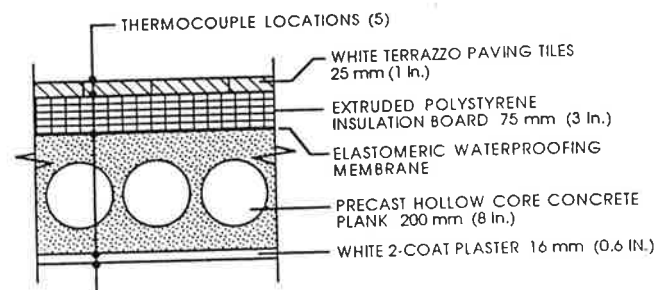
Roof 10: externally insulated (extruded polystyrene) concrete planks.
